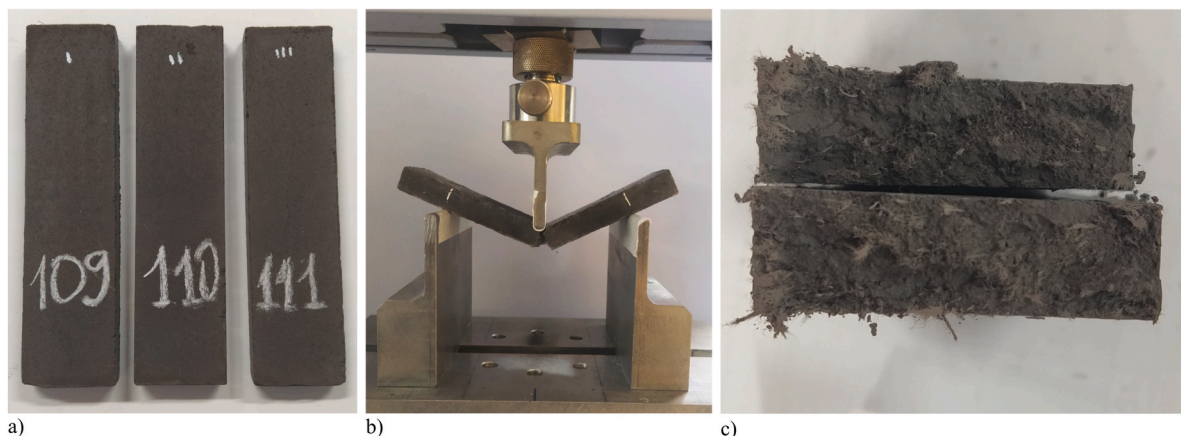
Flexural tests setup: (a) Fabricated specimens; (b) Specimens three-point bending test; (c) Cross-section of FRM specimens.
